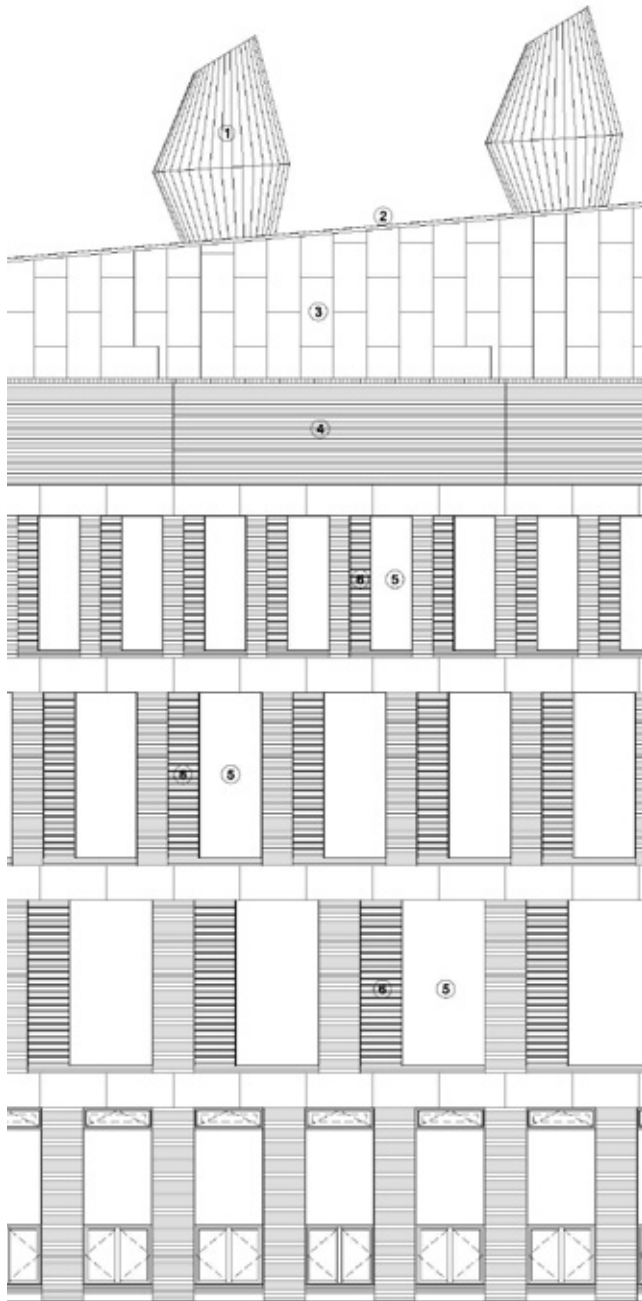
Carr Cotter & Naessens Architect's Haigh Terrace elevation, nts
